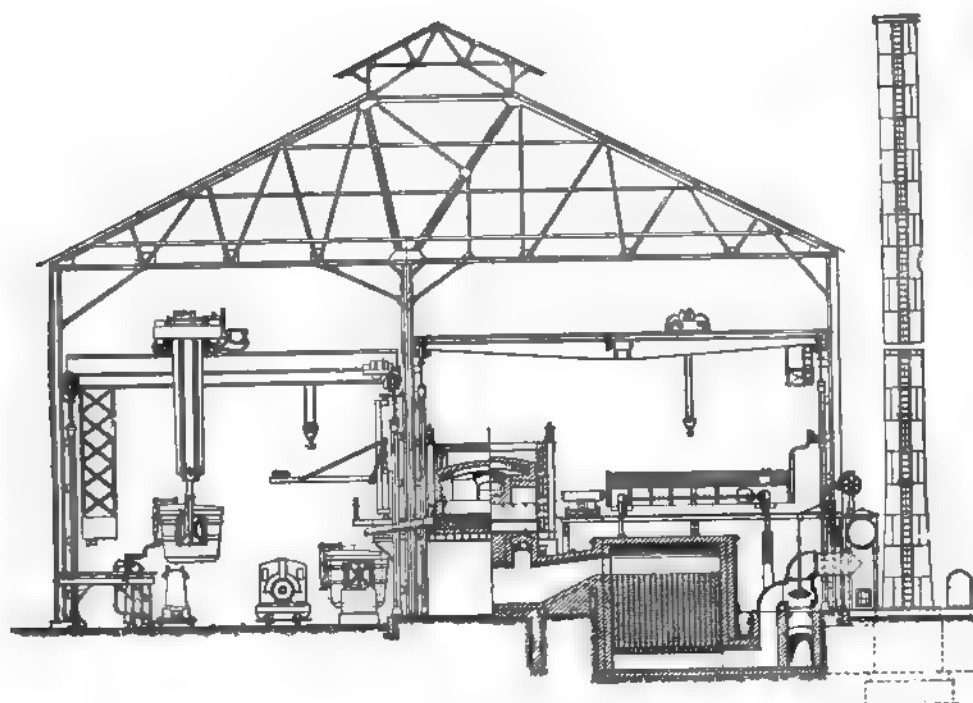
CROSS SECTION THROUGH OPEN-HEARTH BUILDING AT THE SHARON STEEL COMPANY'S WORKS, PA.
